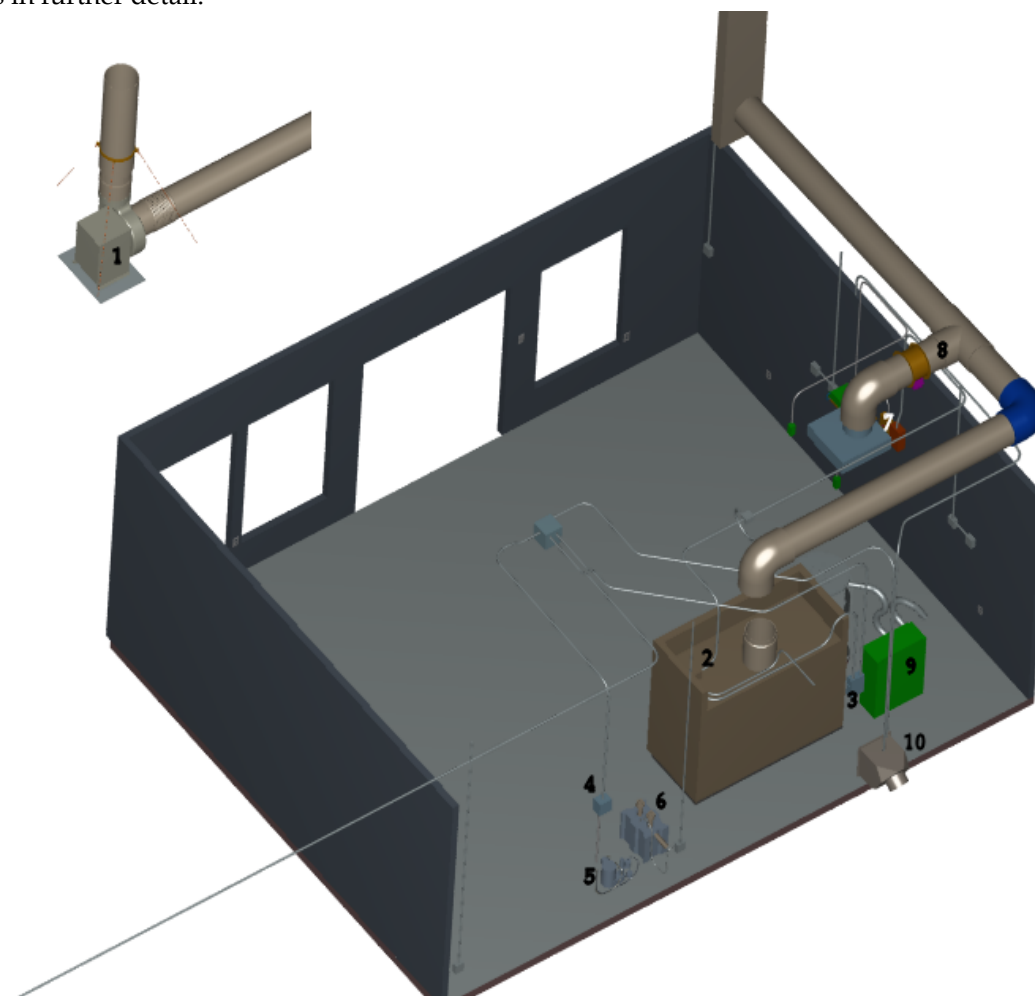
View of chemistry hood assembly in SRF materials lab. Detailed view of the electrical circuits.
